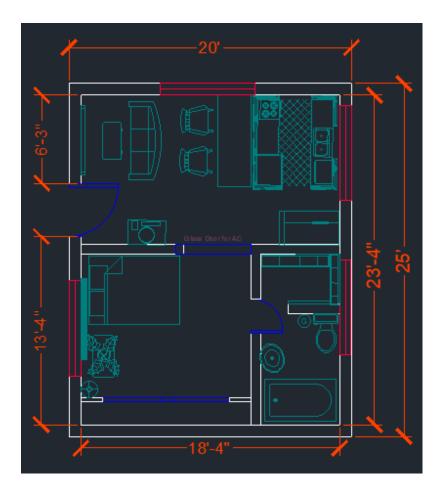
Floor plan of 500sq ft STUDIO APARTMENT (i)
